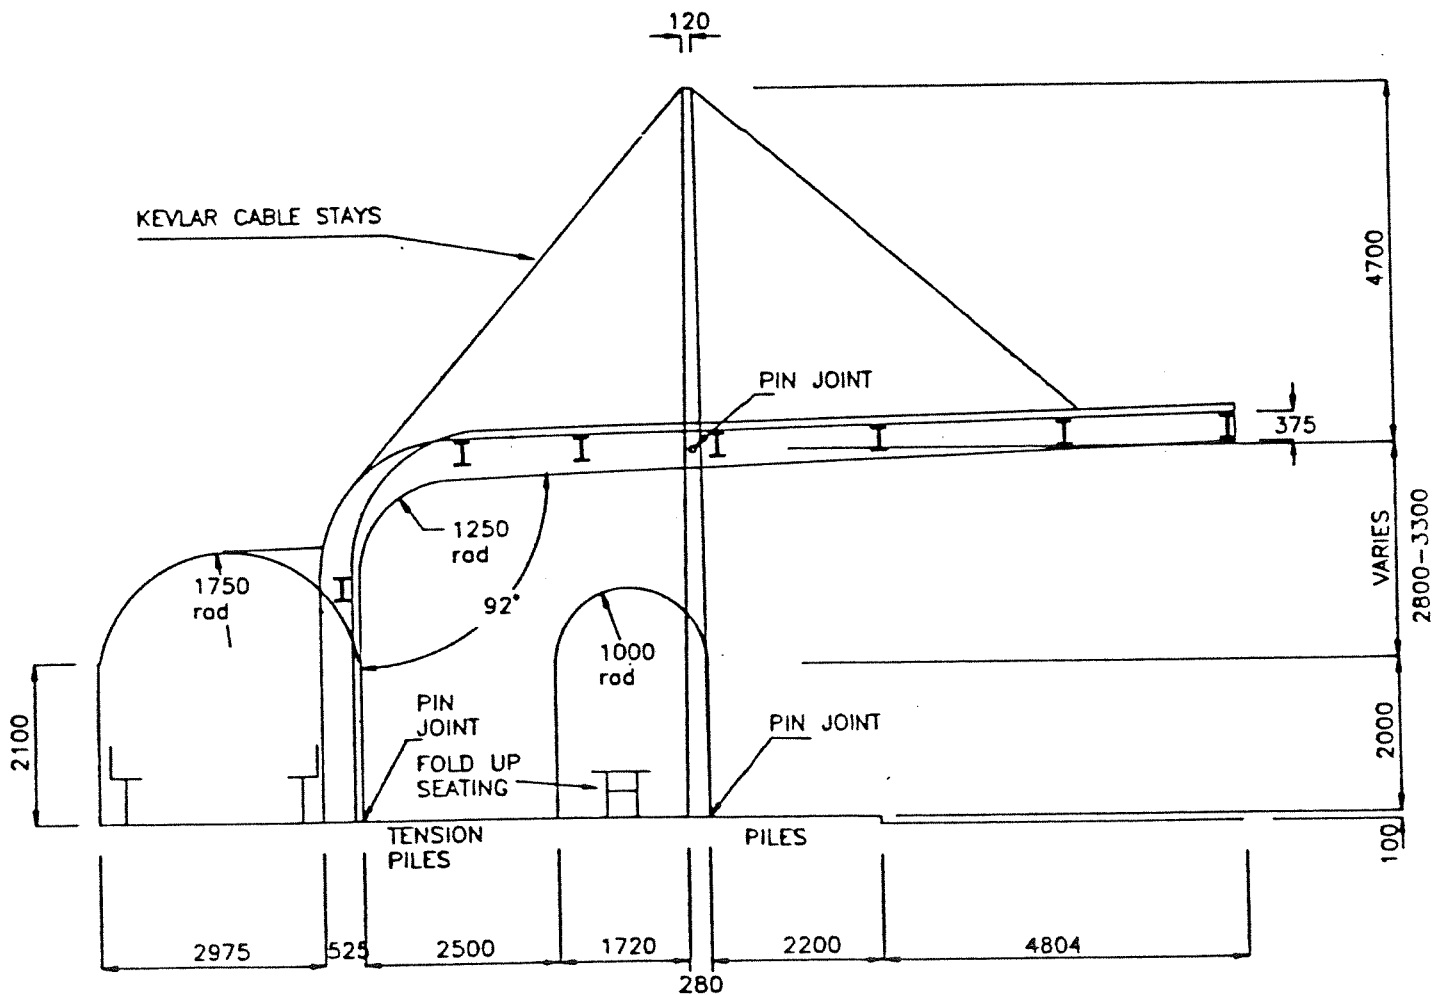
Section through bus station roof, supported by 30 Tonne Type G Parafil cables.
